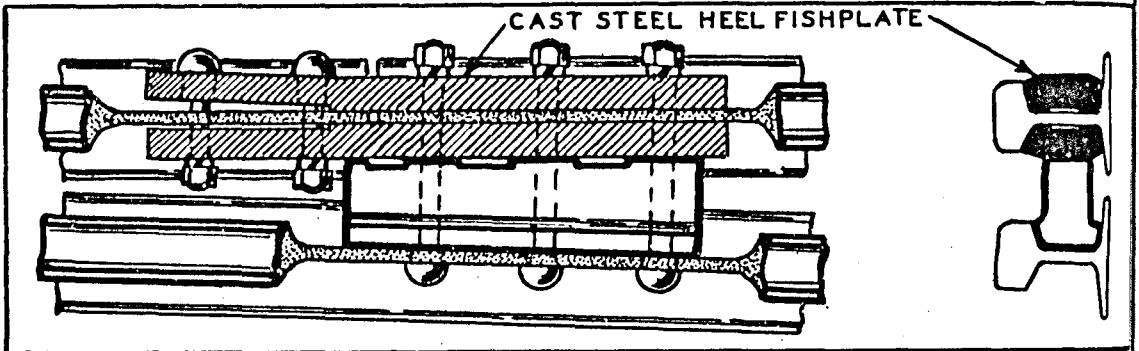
TYPICAL 80 & 100 LB. Y LAYOUT HEEL
